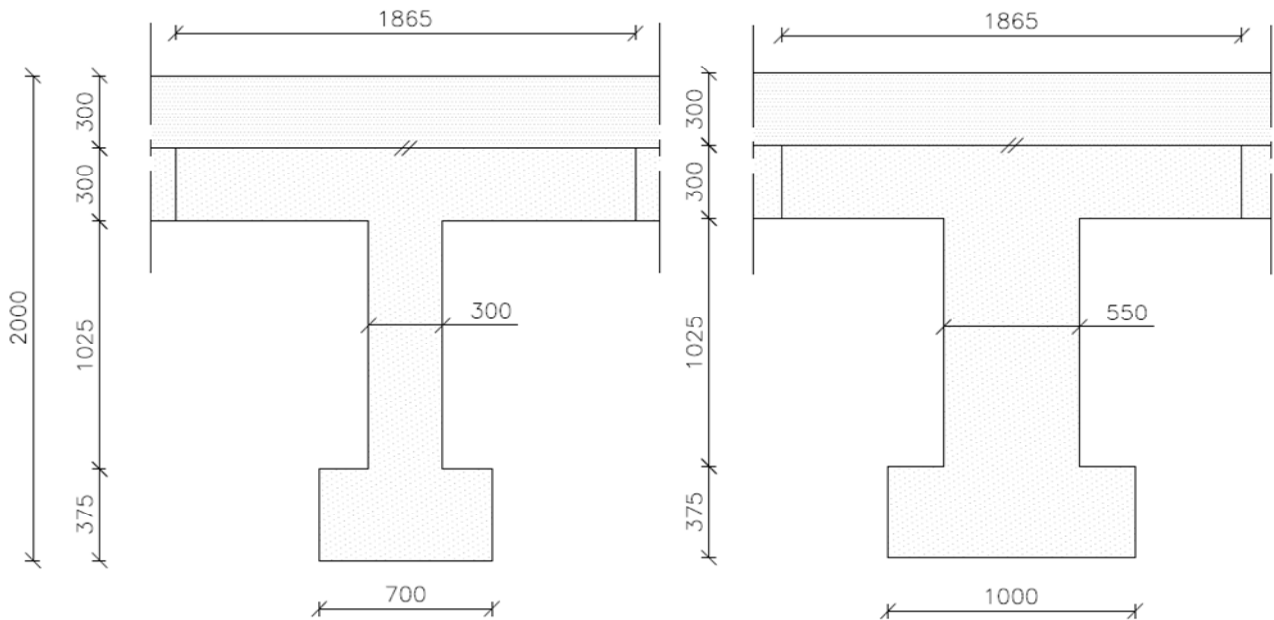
Cross-section of precast elements at midspan (left) and at support (right).
